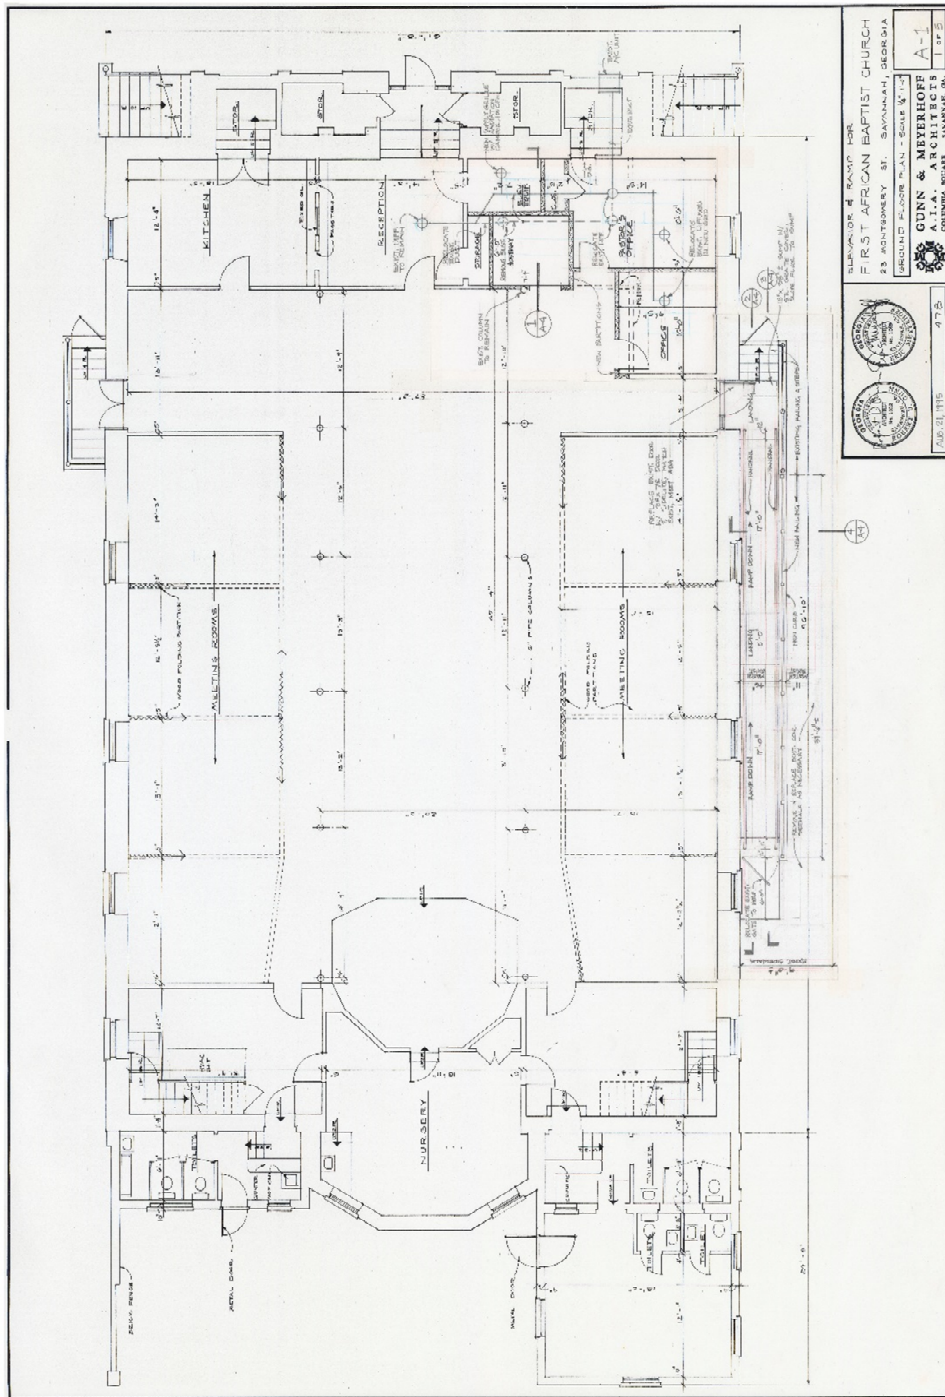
Lower Level Floor Plan of the Fellowship Hall
